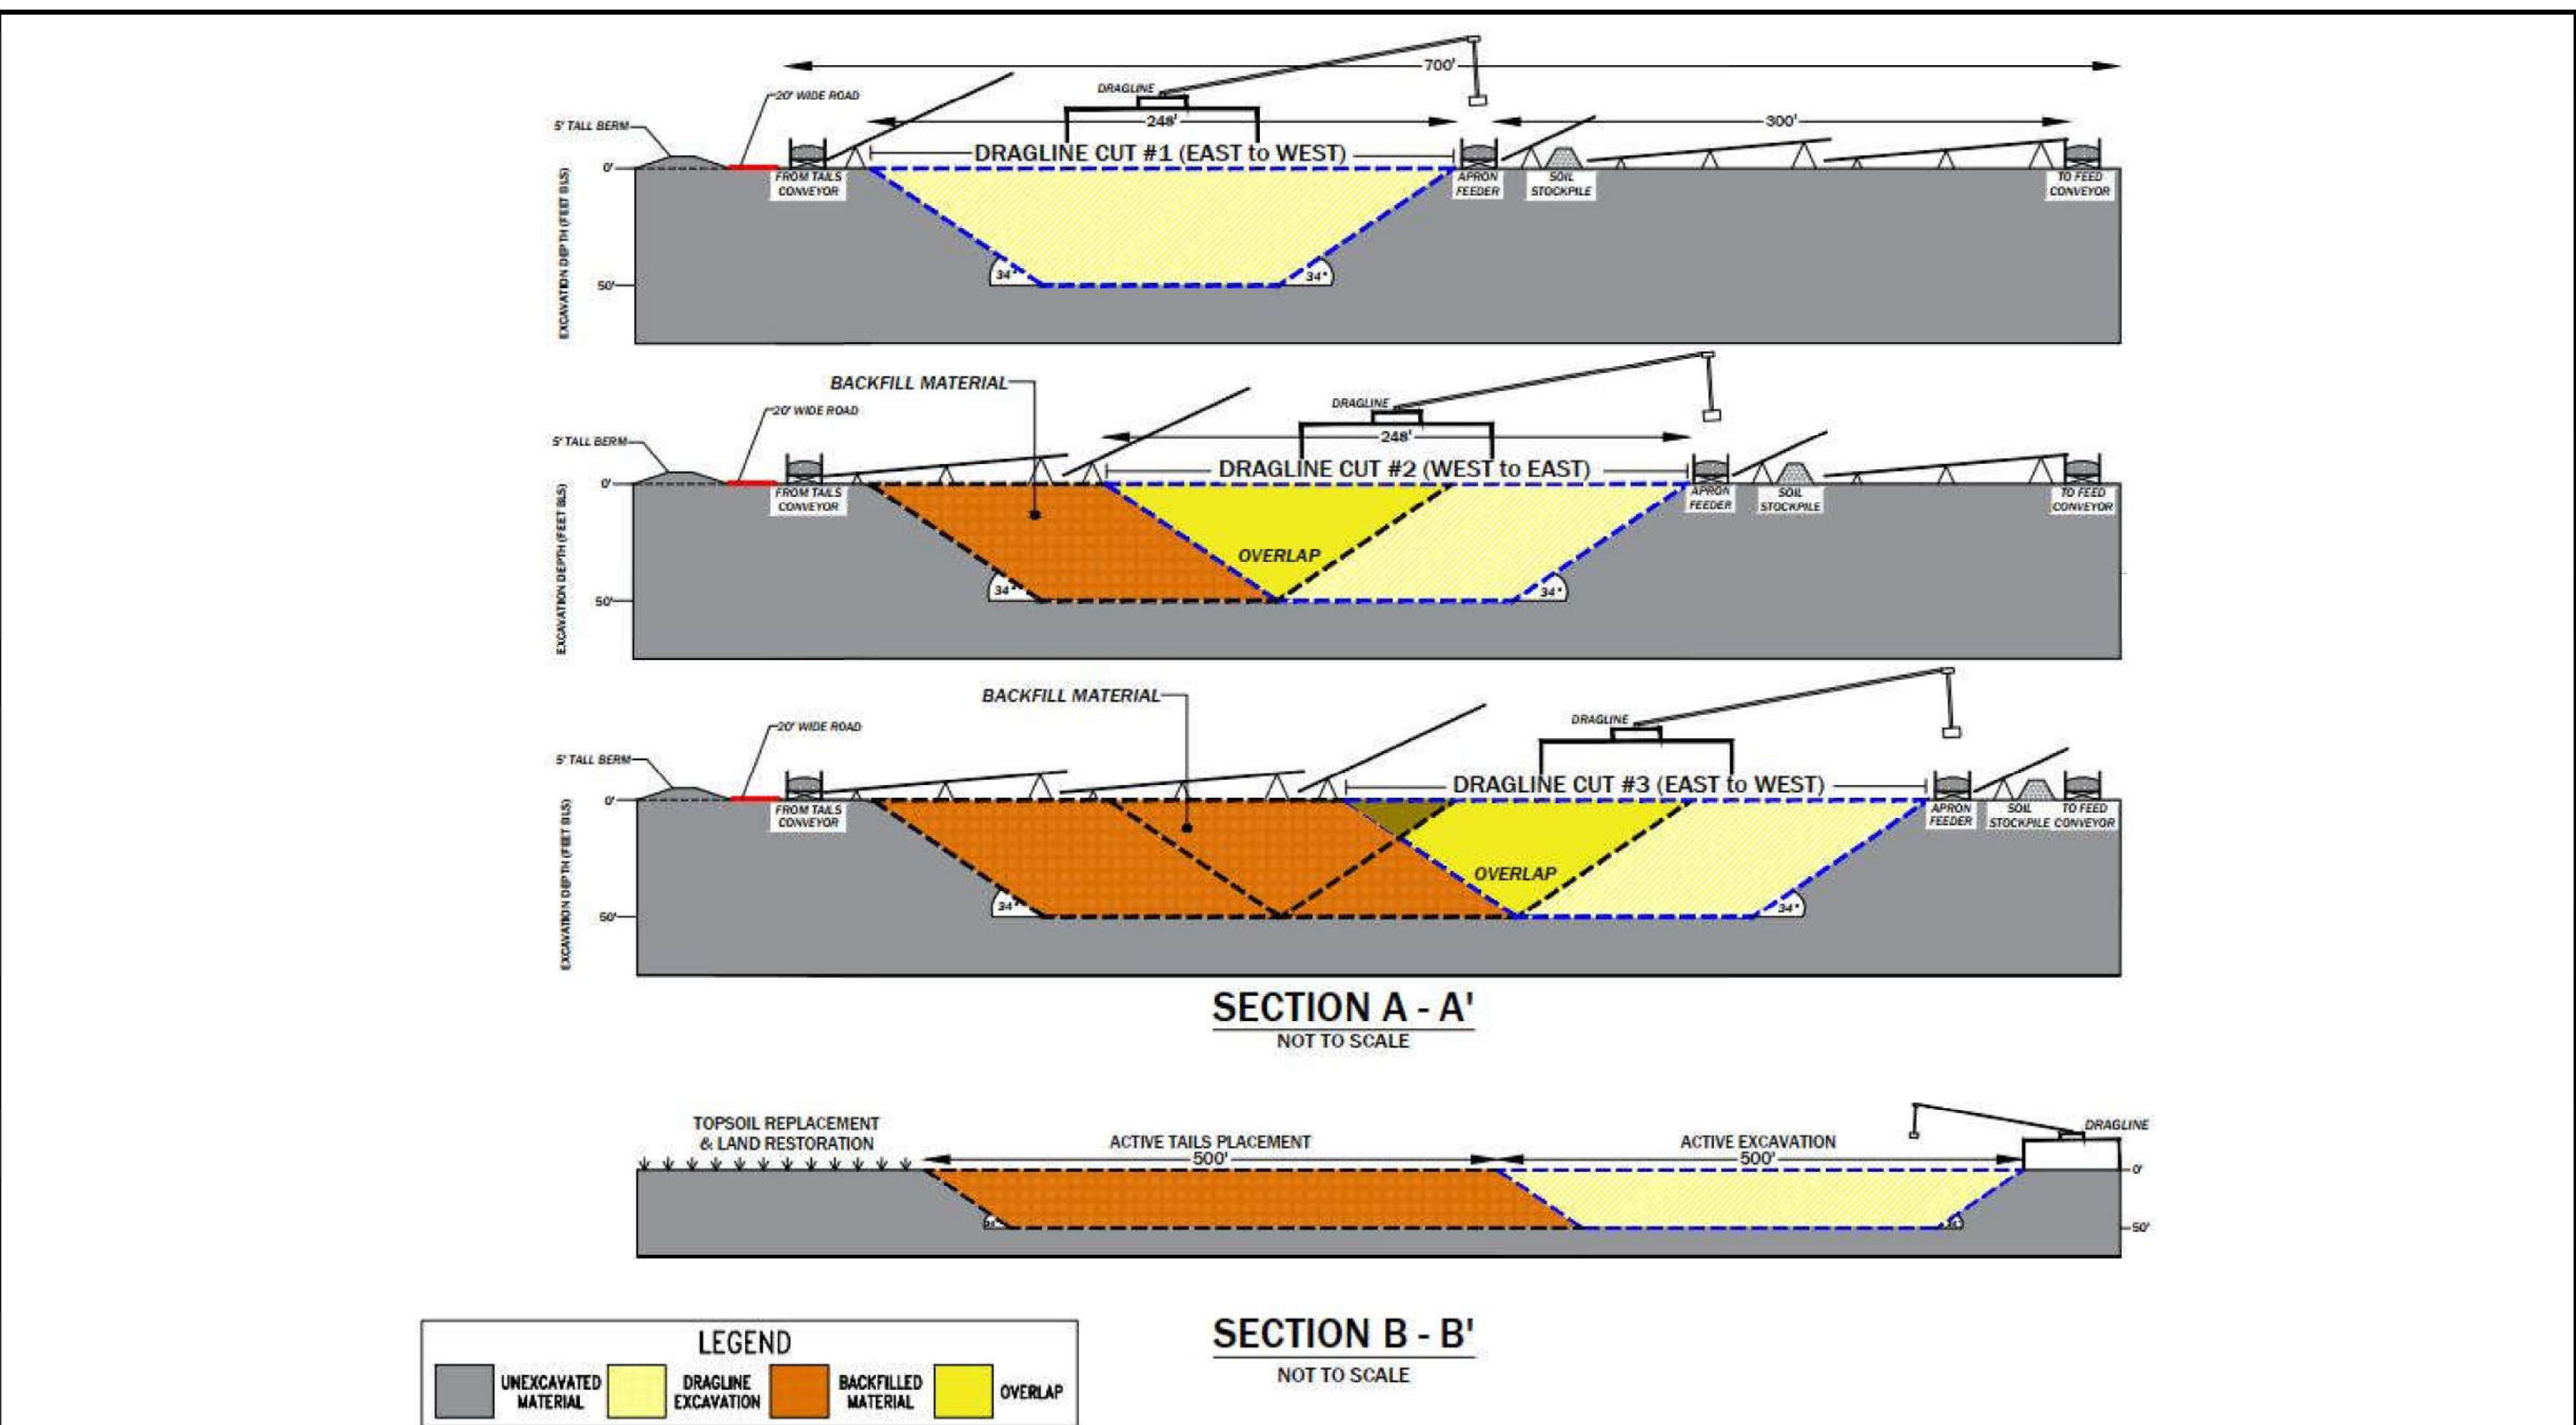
B: MINING PROFILE/CROSS-SECTION (TYPICAL)
